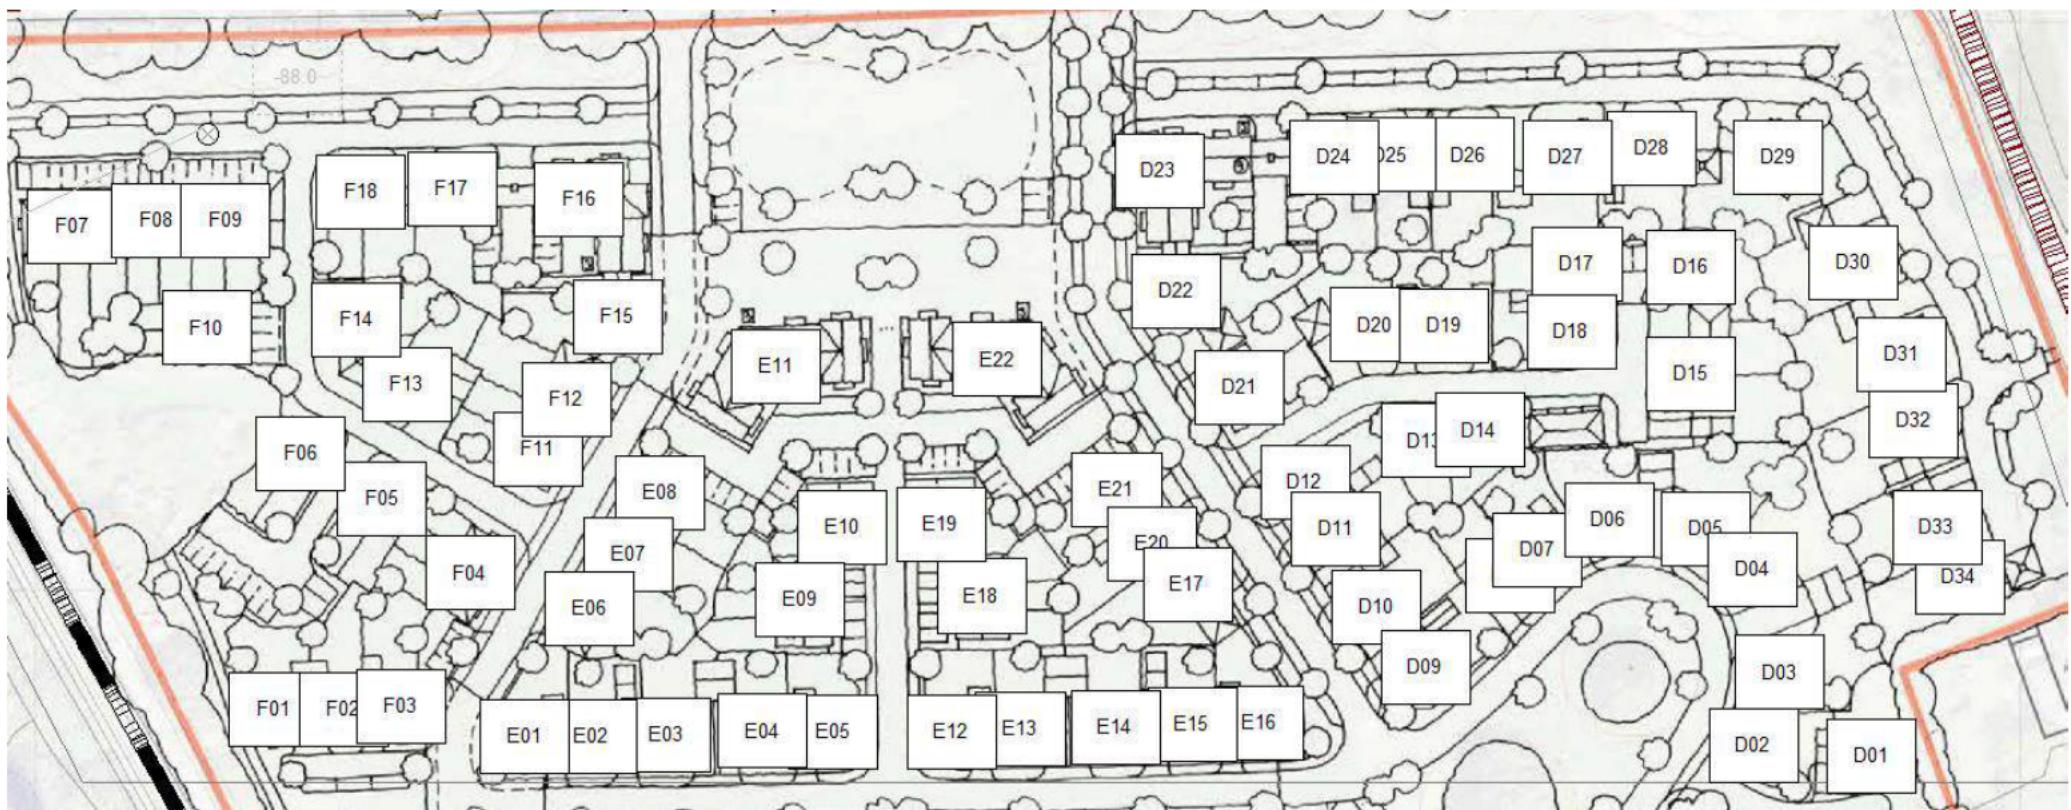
PLAN OF PROPOSED DEVELOPMENT AT PONDTAIL FARM – ASSESSMENT AREAS D, E & F
